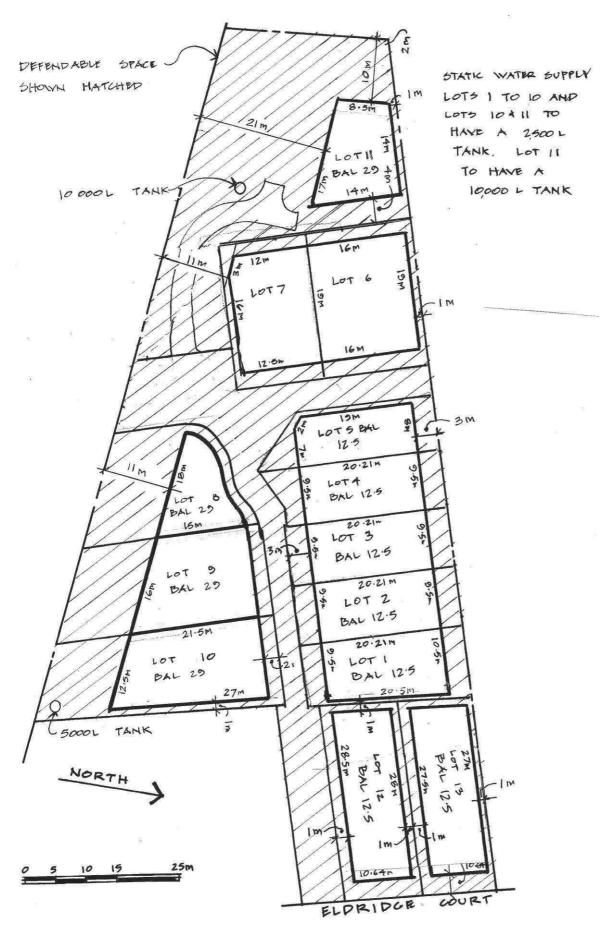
DEFENDABLE SPACE AND BUILDING ENVELOPES
